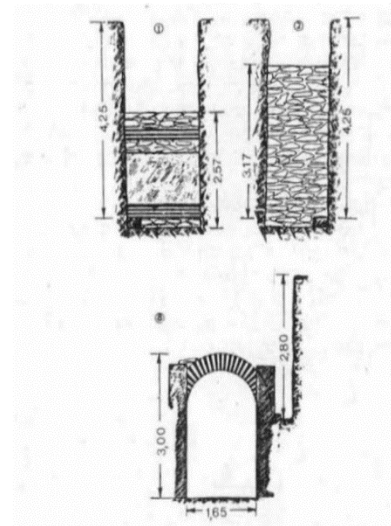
Sections in position 1 and 2 and 8 of the Church (Pitilakis D.)
